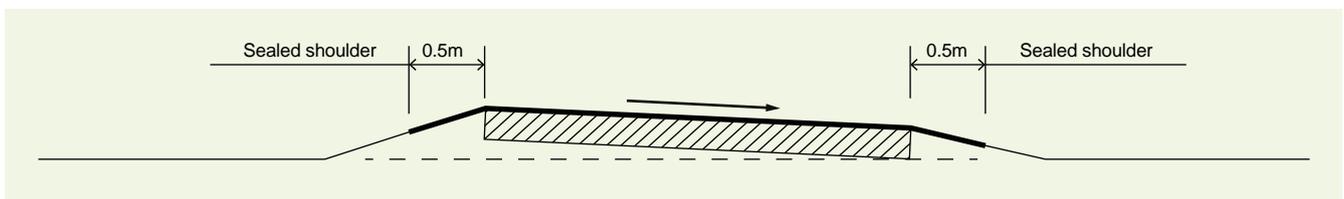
Drainage and crossfall requirements for elevated path in flat terrain (image courtesy of Austroads Guide to Road Design: Part 6A (Figure 5.14)).
